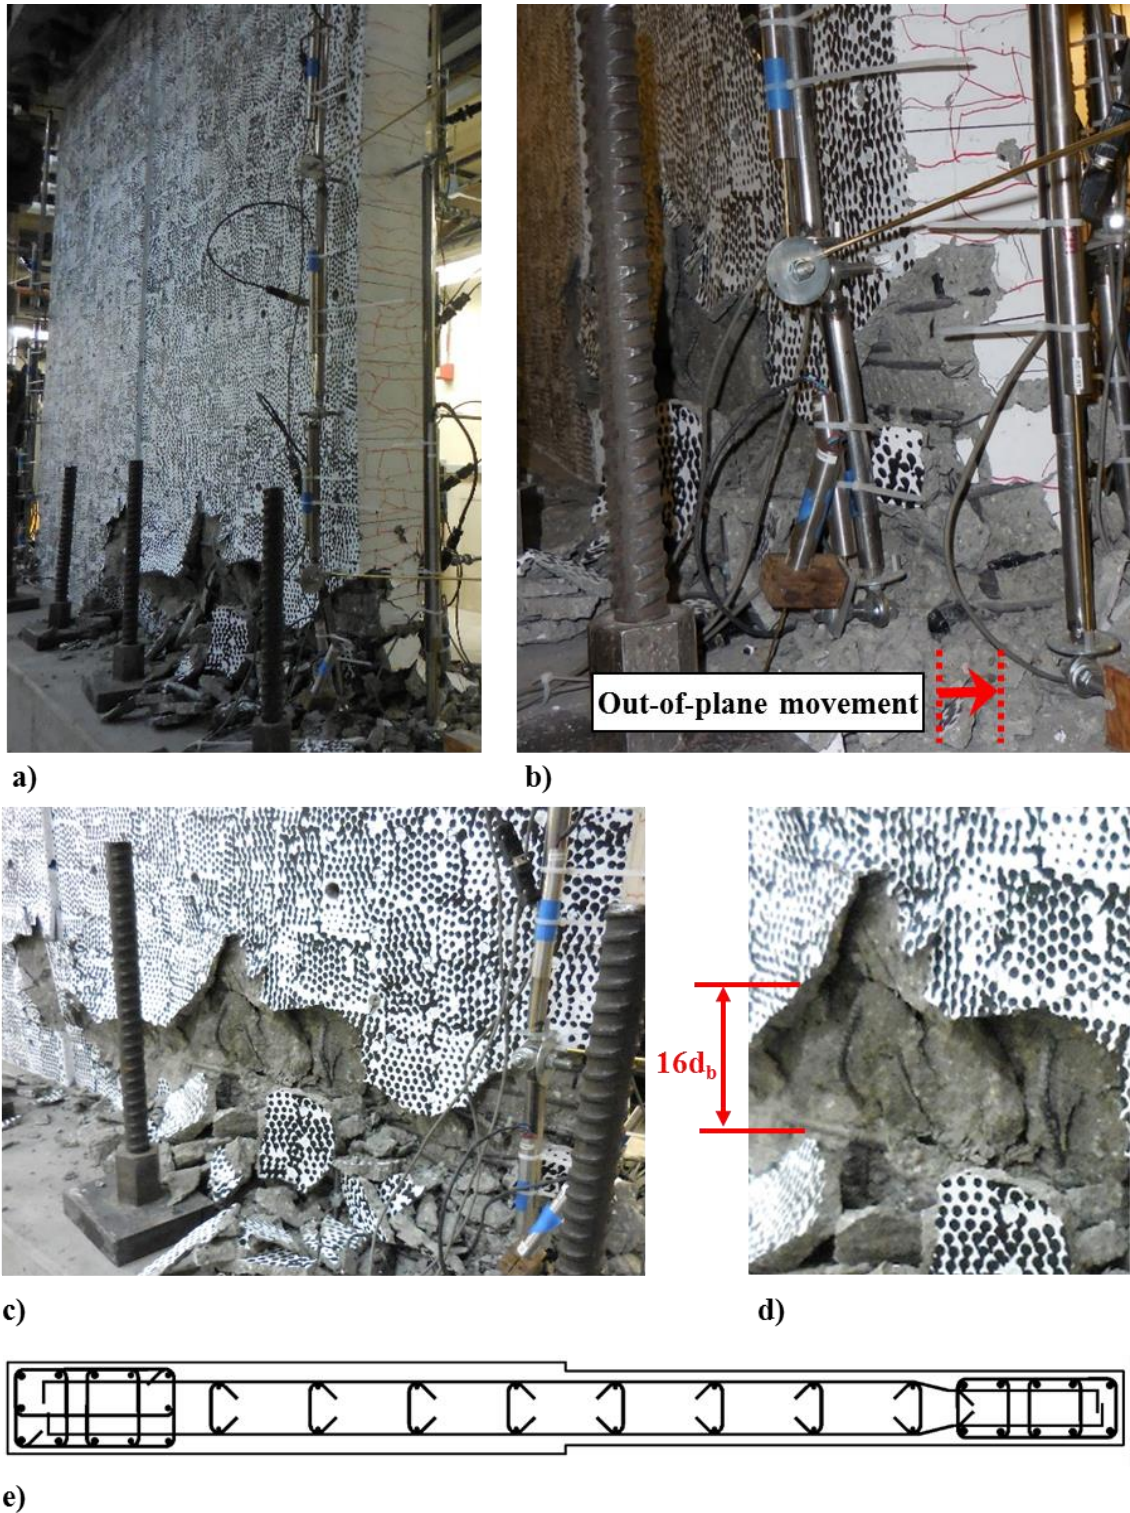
Specimen WP5 – a) Web crushing (-3% rotation); b) Out-of-plane movement of east boundary at base of wall (-3% rotation); c) Buckling of longitudinal reinforcement in web; d) Close up of buckled web longitudinal reinforcement; and e) WP5 web detail (WEB-3) with longitudinal reinforcement supported laterally by cross-ties at $16d_b$
